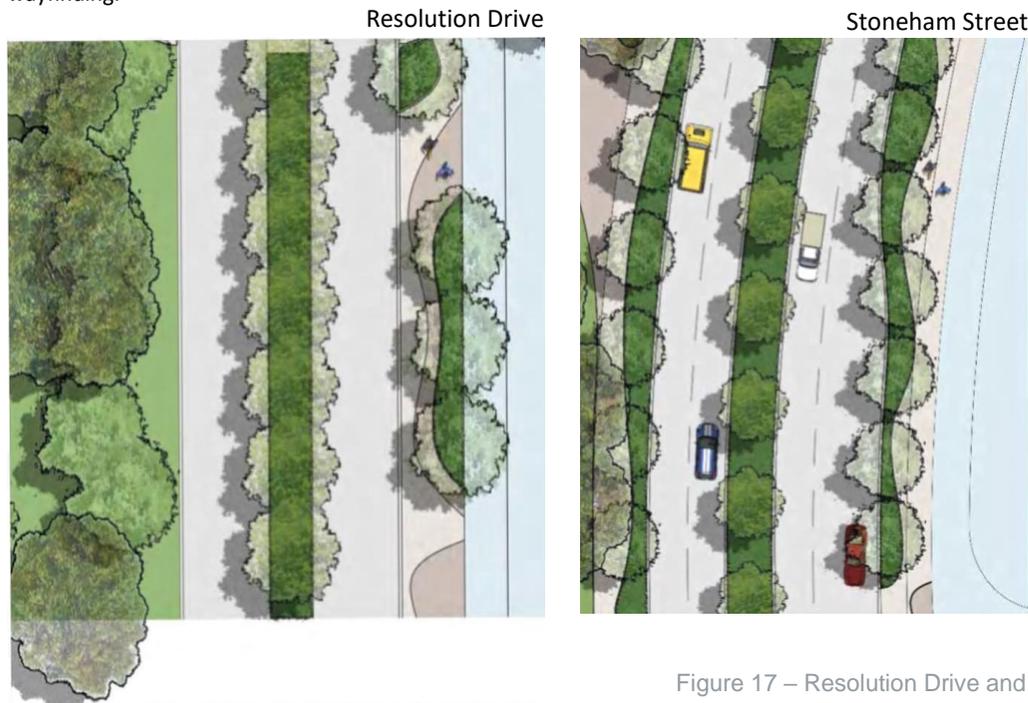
Resolution Drive and Stoneham Street (Plan Extract and Indicative Section)
